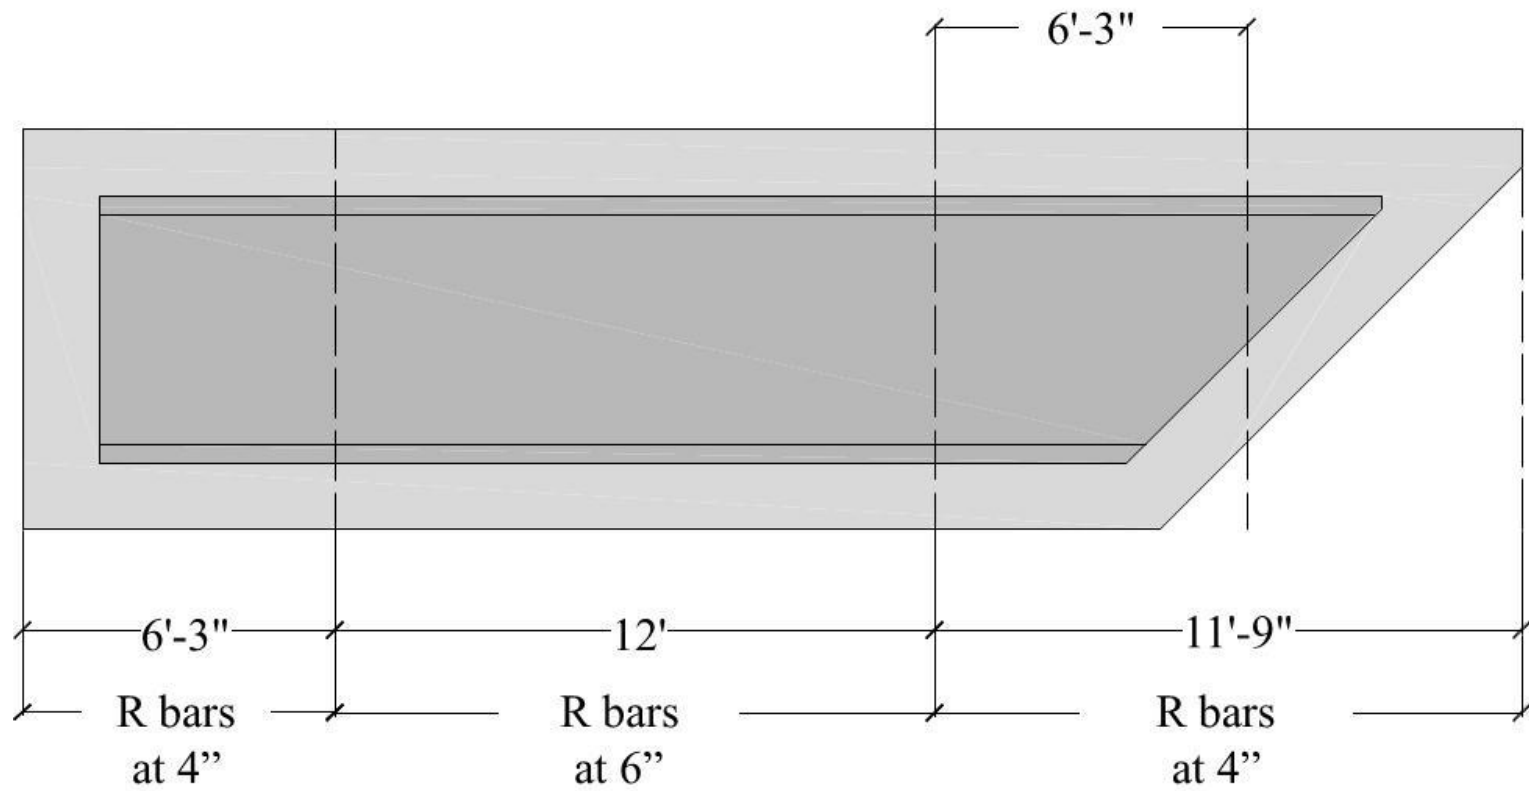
Beam 1 primary shear reinforcement (R bars) layout
